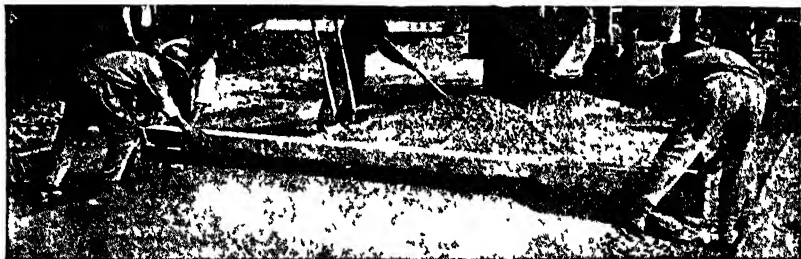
,815.—Finishing concrete pavements 1. Striking off for contour.
